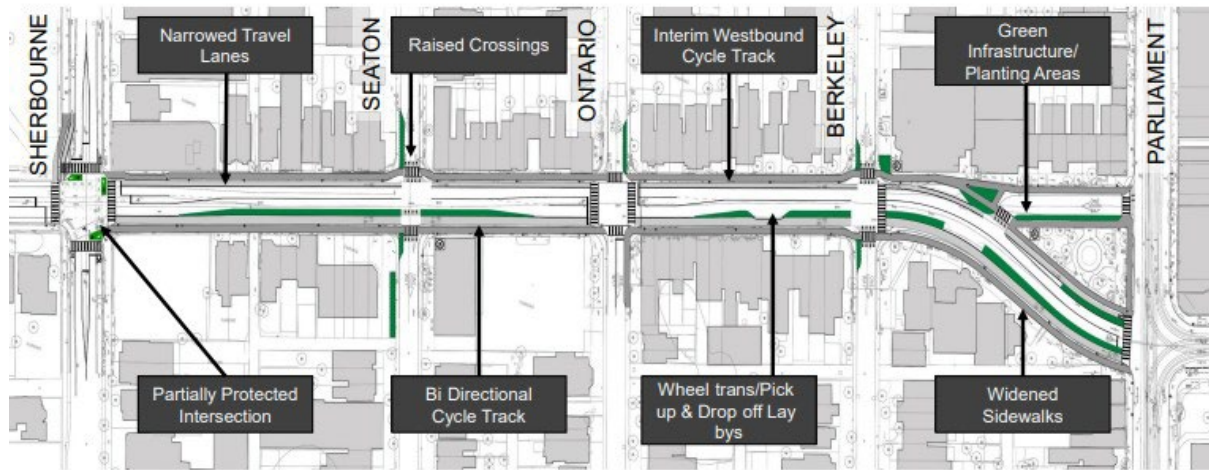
Gerrard Street East Complete Street project between Sherbourne Street and Parliament Street including protected intersection features, raised crossings, wider sidewalks and green infrastructure.
